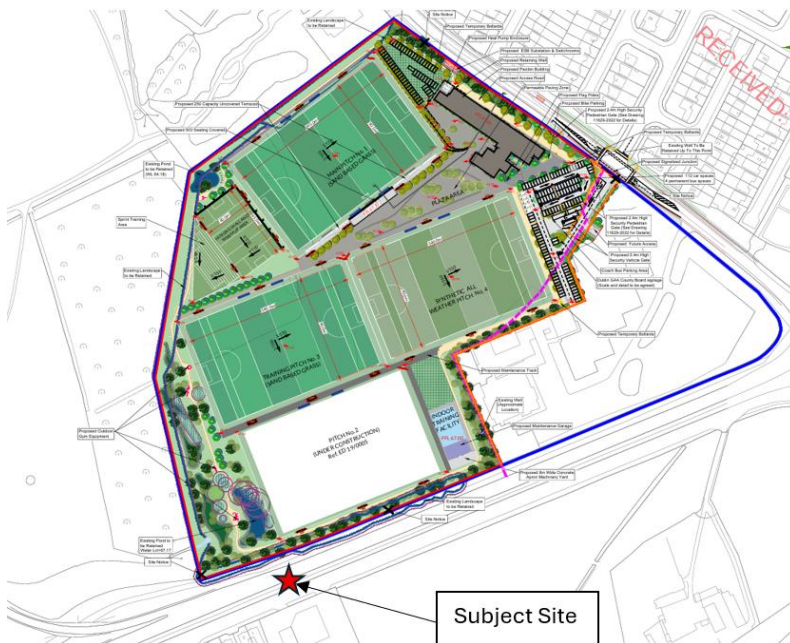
SD23A/0304 Site Layout (Source: SDCC)
